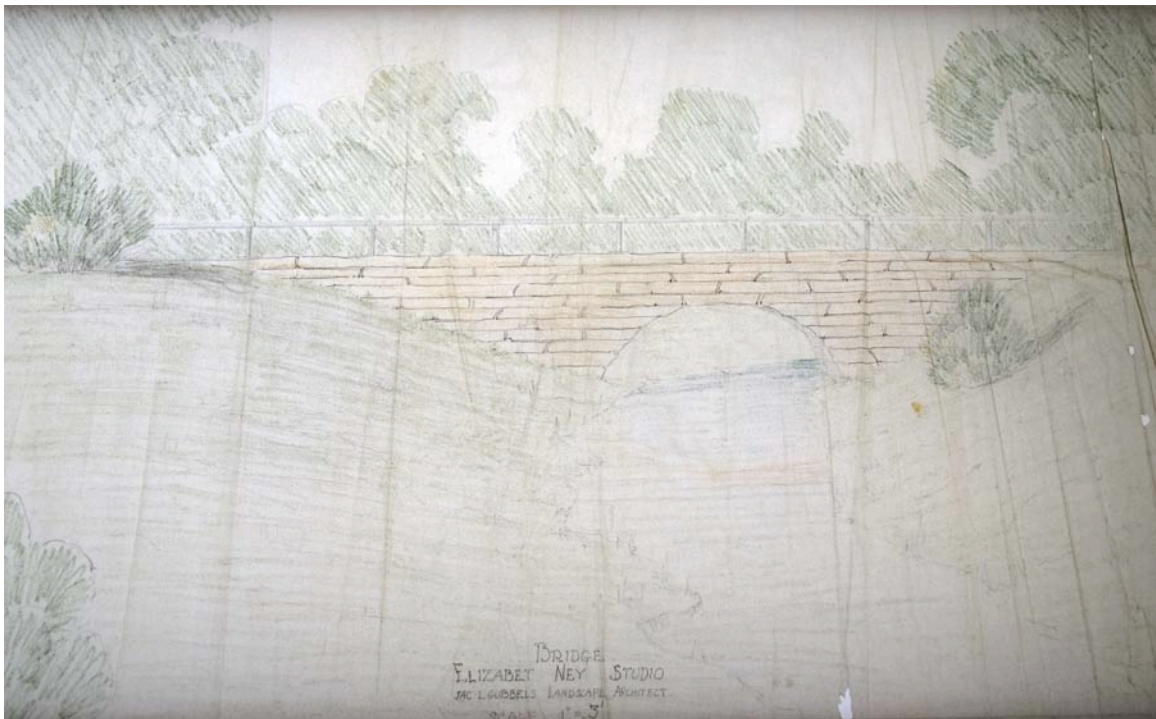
Alternative bridge design by Jac L. Gubbels for the Elisabet Ney Museum. The bridge was never built. Architecture files, Austin History Center. Used by permission.
